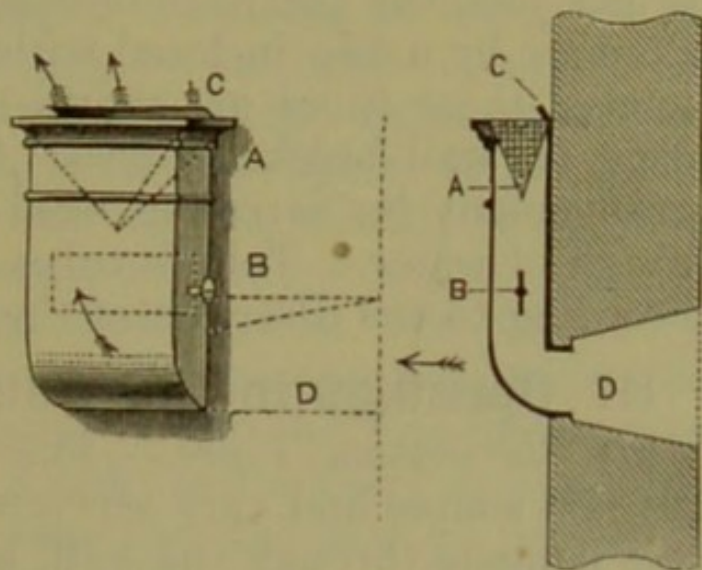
Wall Bracket Inlet on Tobin's System. Section of Wall Bracket Inlet.
